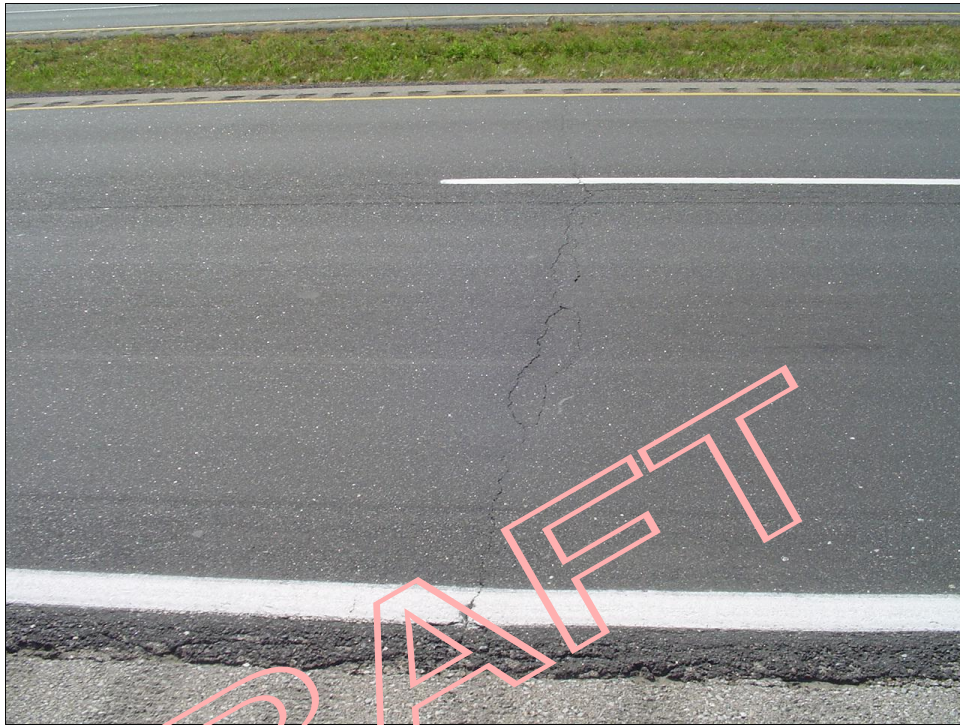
Highway 401 westbound lanes between North Talbot Road and Huron Church Line. Typical transverse crack.
